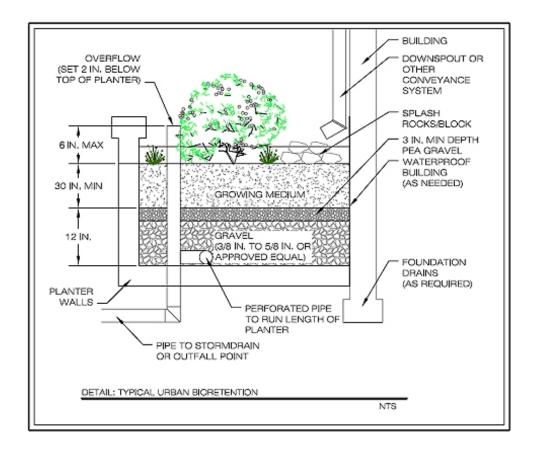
Stormwater Planter Cross-Section (source: VADCR, 2010)
